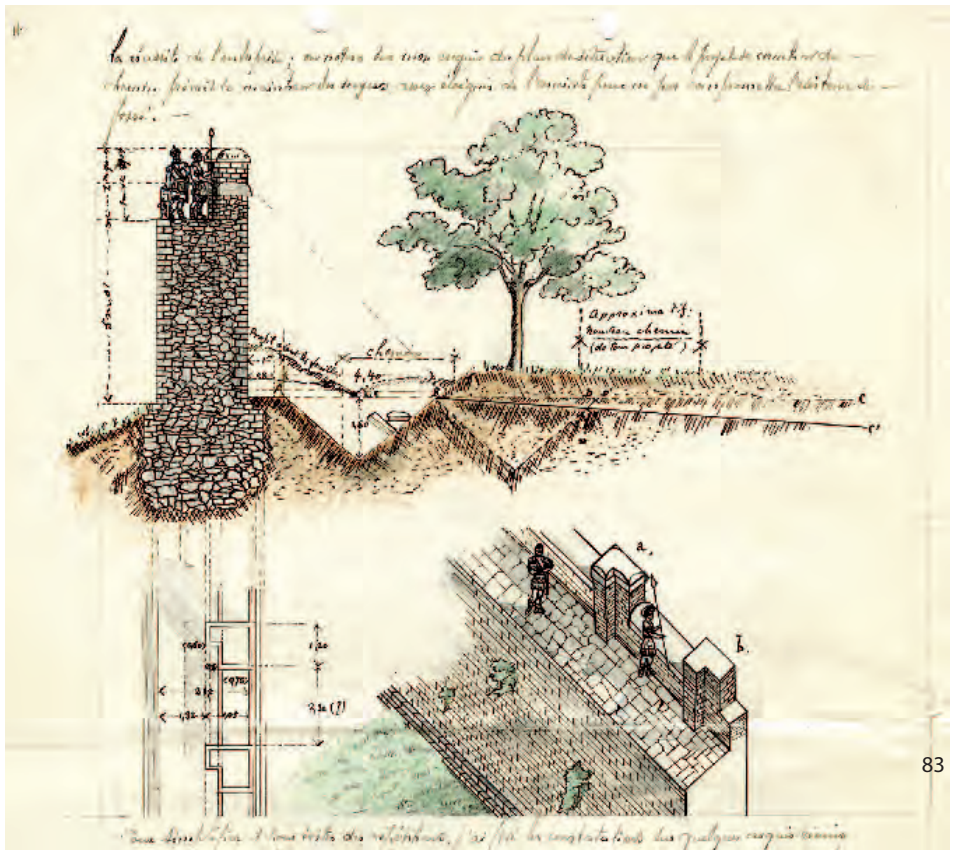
City wall. Restoration and reconstruction to the south of the Tornallaz tower (1916-1919).
